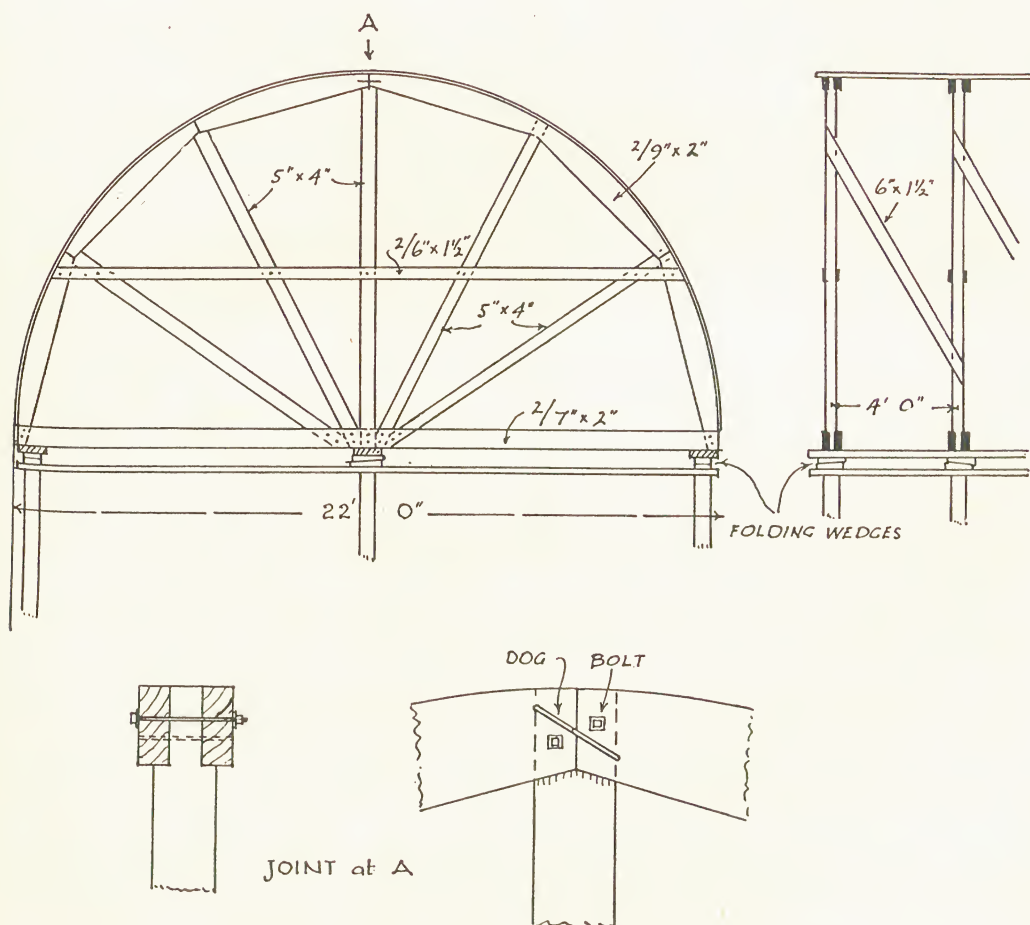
A framed centre for a brick arch bridge, 22 feet span.
